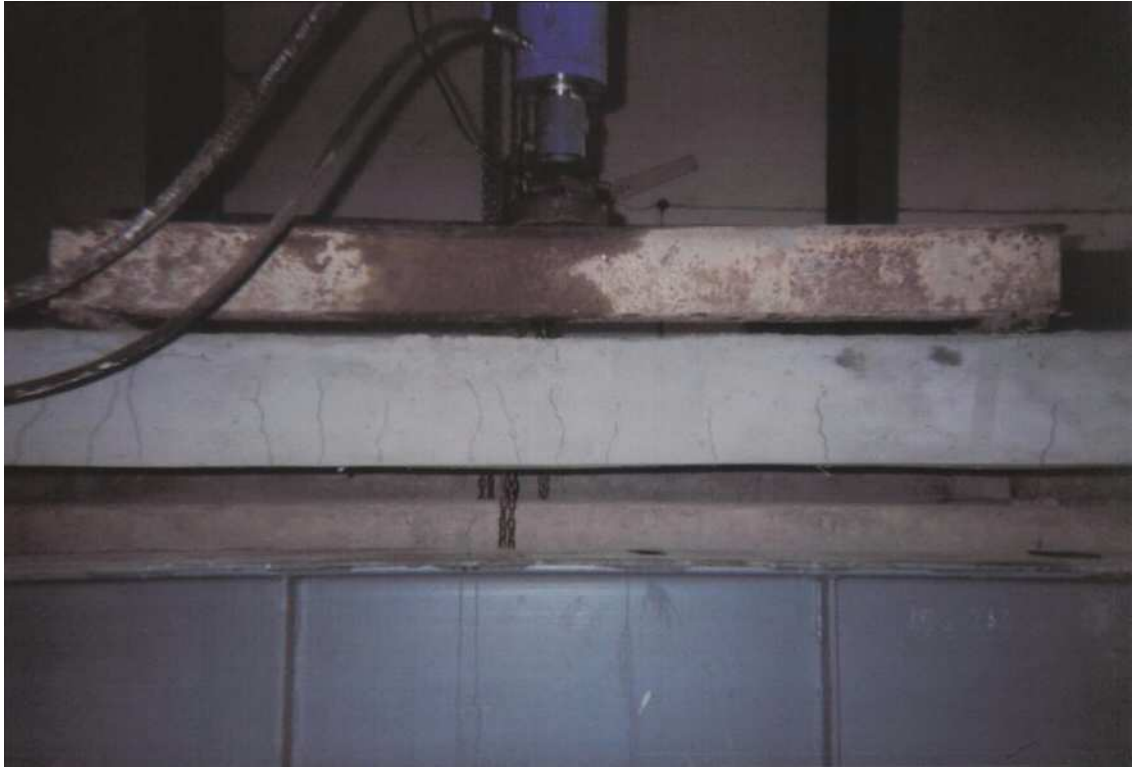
SPECIMEN R3 (75 % STRESSED)
